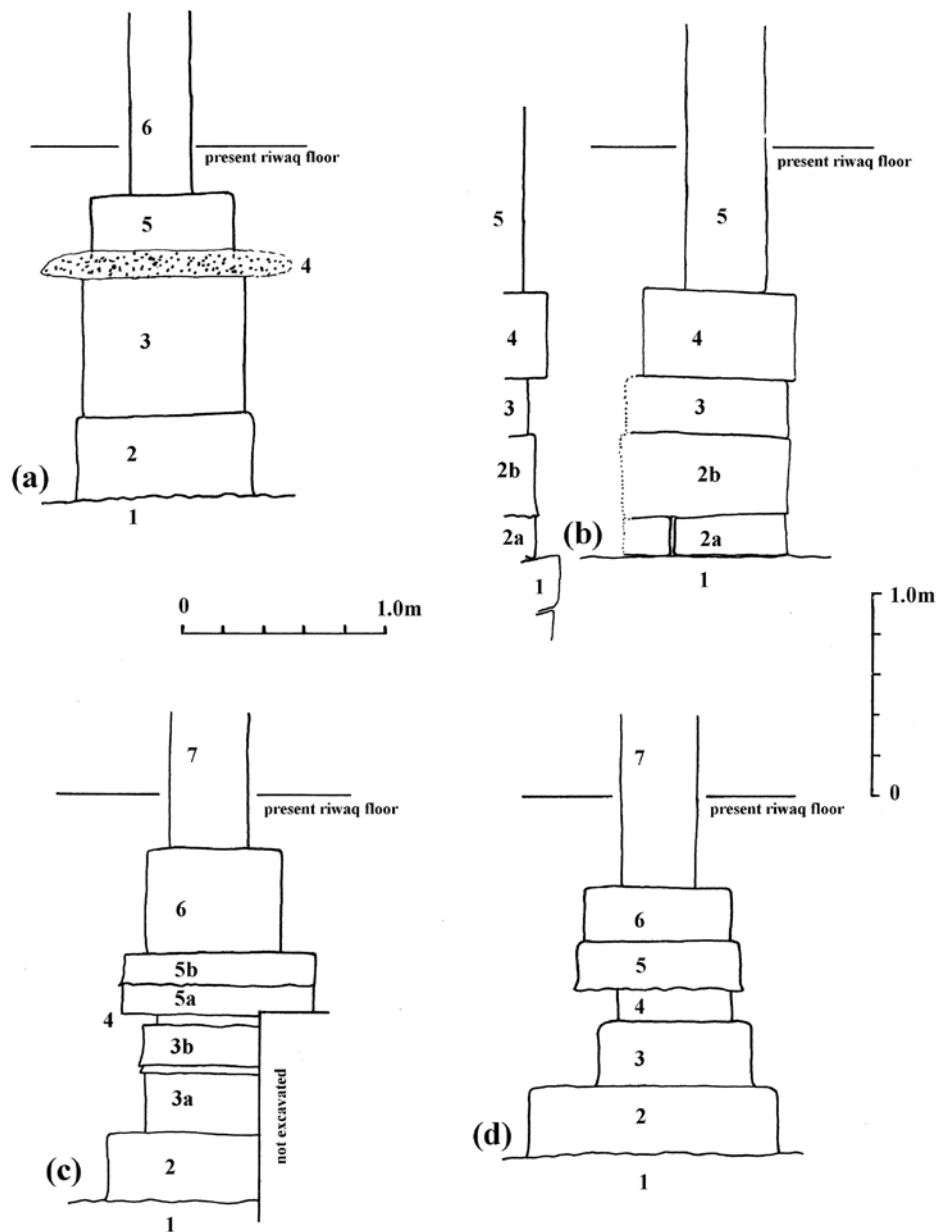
Examples of rebuilt pillars in the north and south *riwāq*:
